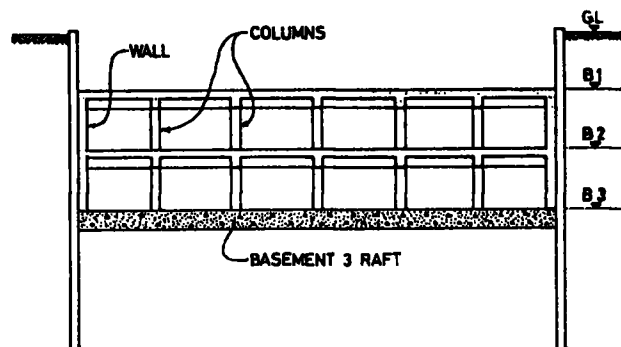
T3 - Section T-T Through Podium upto Construction of Basement 1 (Schematic. Car Ramps not shown)
